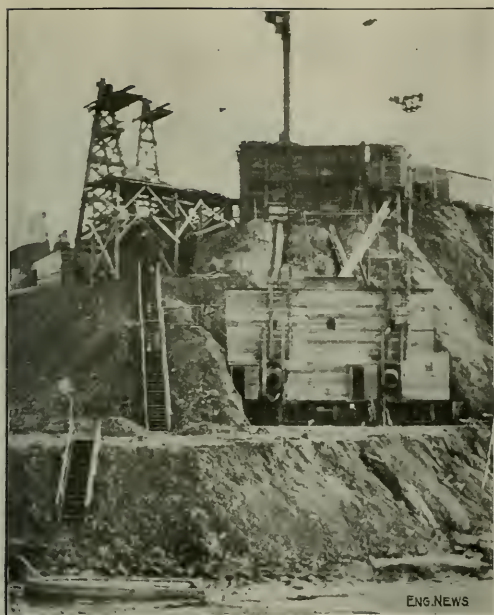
GRAVEL BIN AT BASSANO DAM, WITH GATE-CONTROLLED PIPES LEADING TO MEASURING HOPPERS OVER CONCRETE MIXERS
